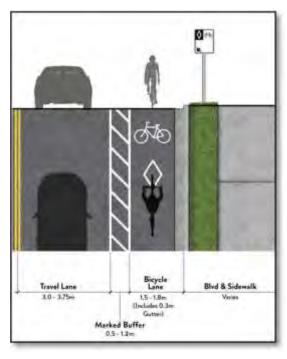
Cross Sections and Plan Views of Bicycle Lanes (Urban Cross-Sections)
